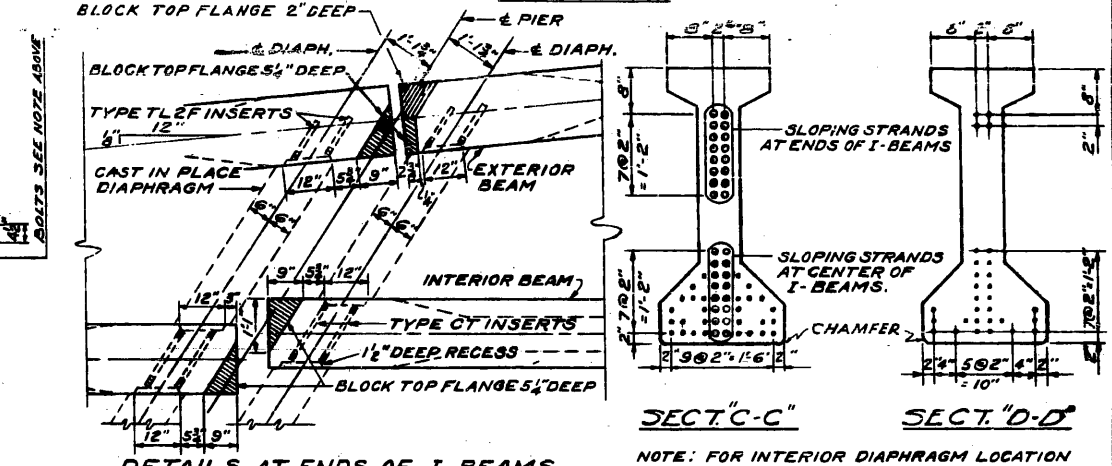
DETAILS OF PRESTRESSING STEEL FOR SPANS 2 AND 3
